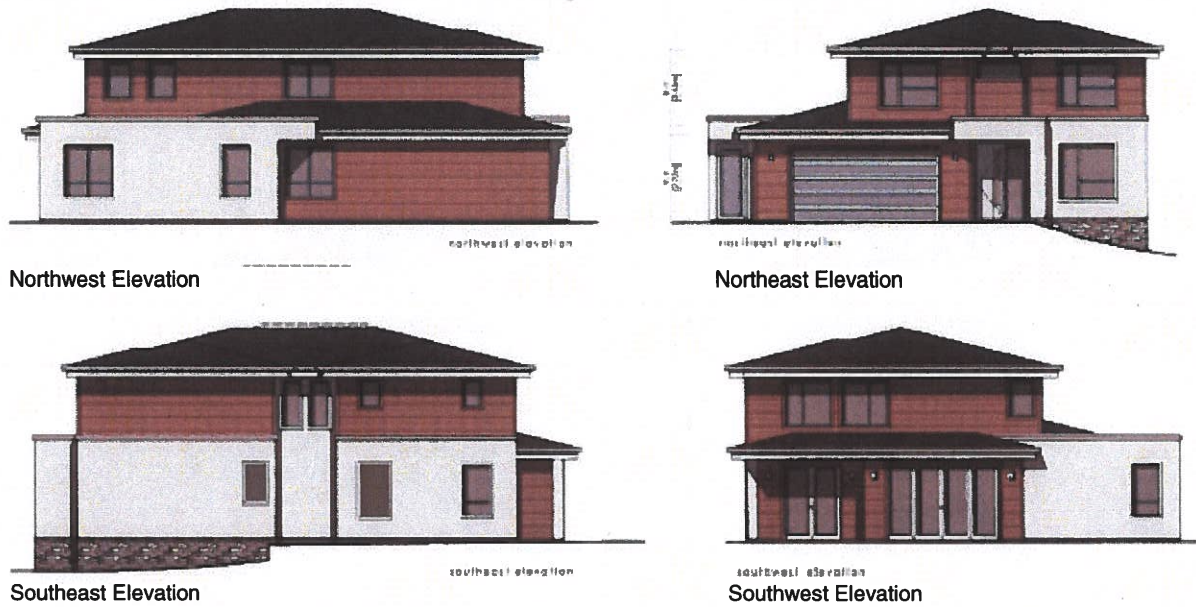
Proposed (Revised) Elevations – Proposed Lot 2 (from plans by Outline Home Design)
